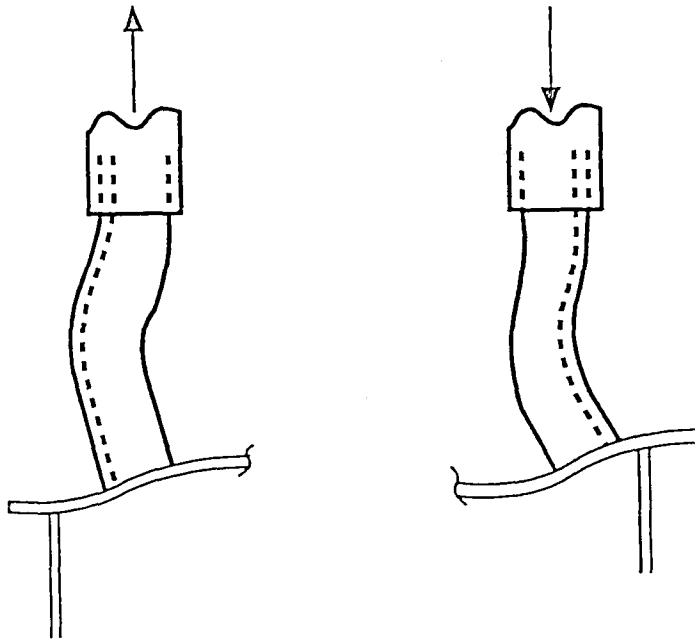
Bending induced in angle due to flexibility of plate and rigidity of clamp fixture
